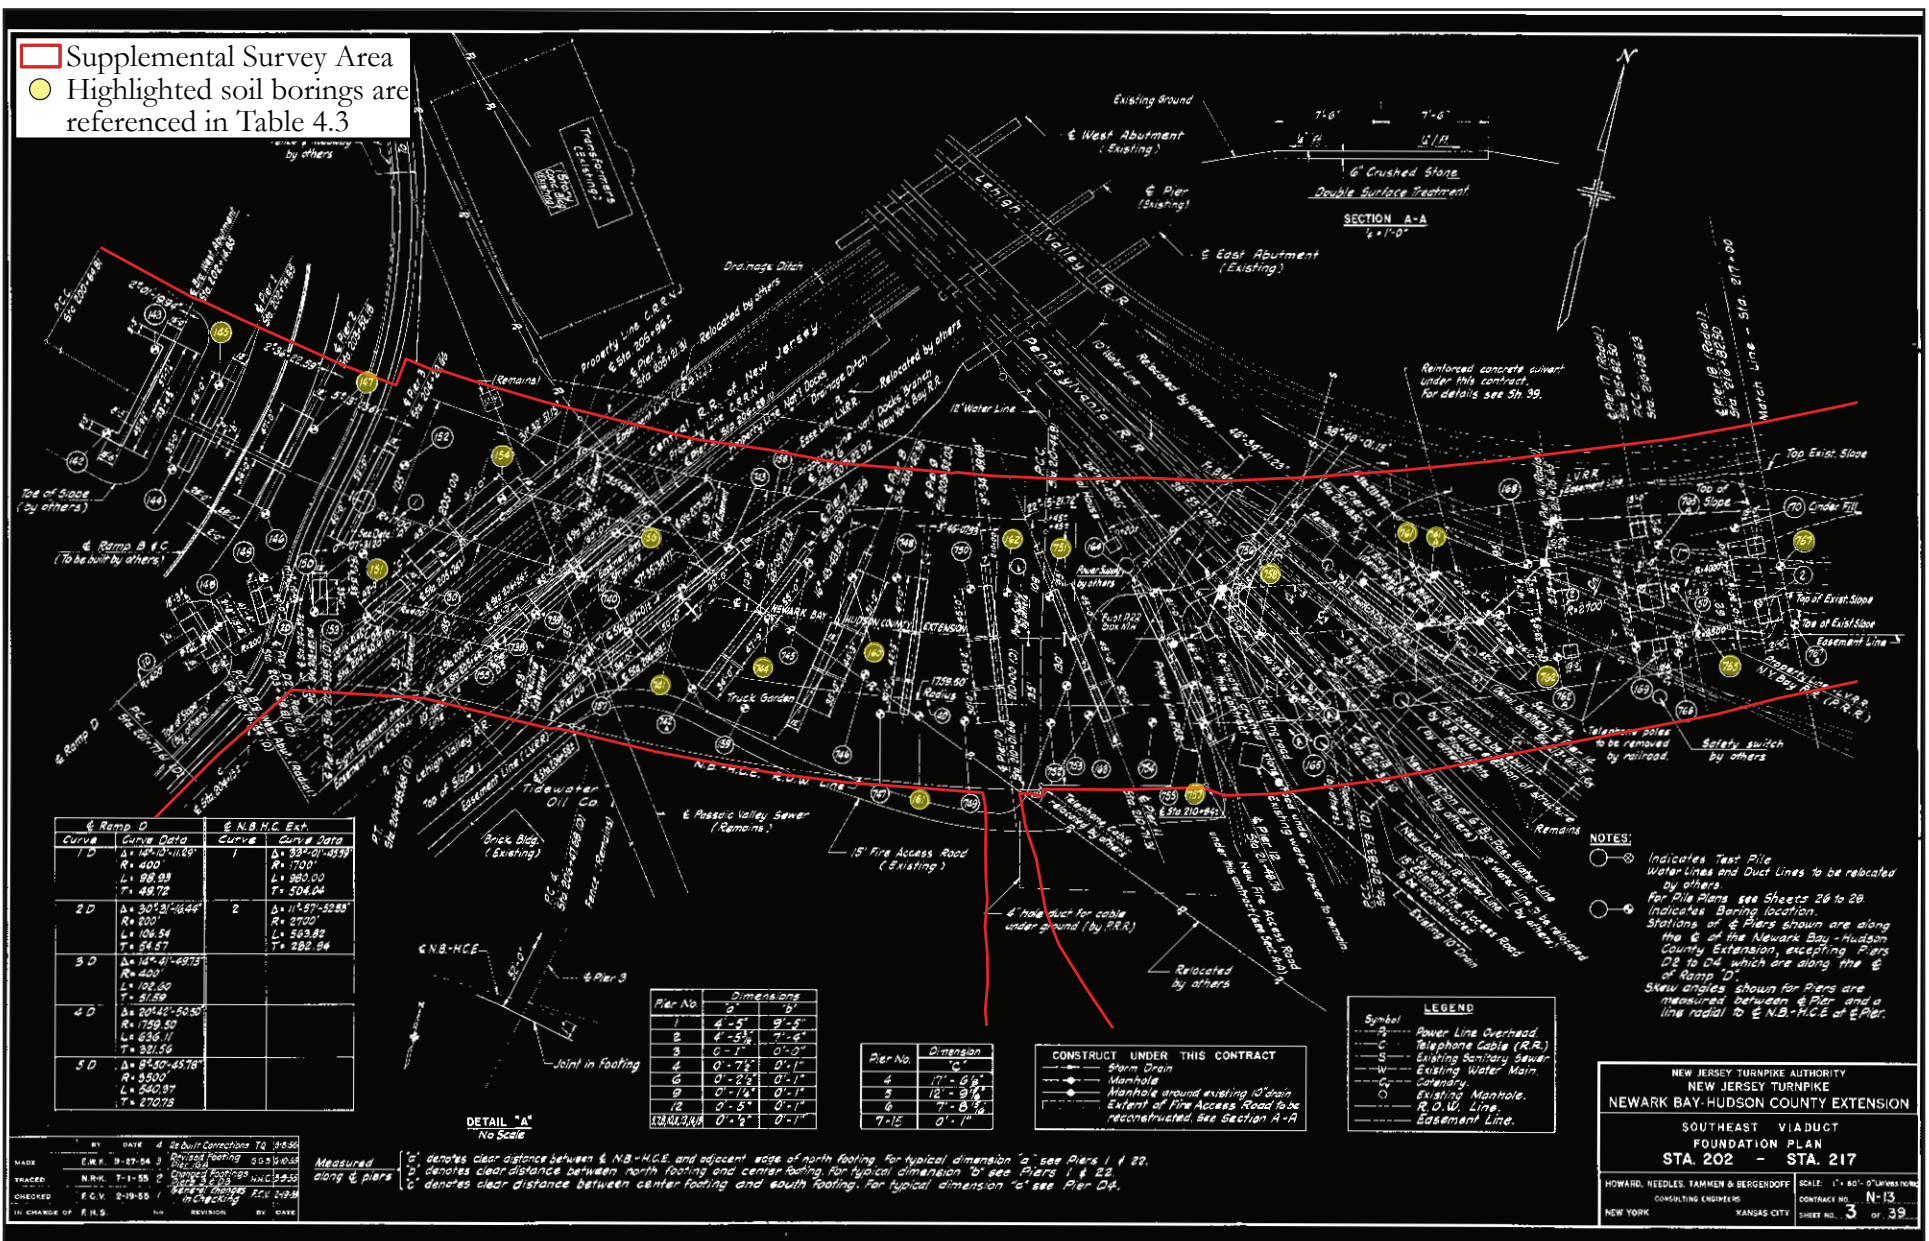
Southeast Viaduct Foundation Plan, Station 202-Station 217, showing soil boring locations (Howard, Needles, Tammen and Bergendoff 1954a).
